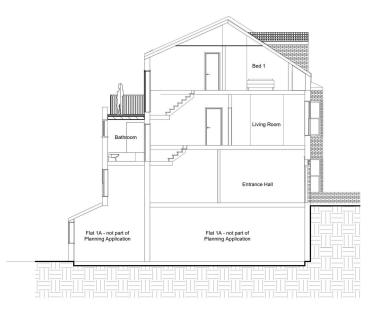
Proposed section showing access from second floor half landing onto roof terrace
